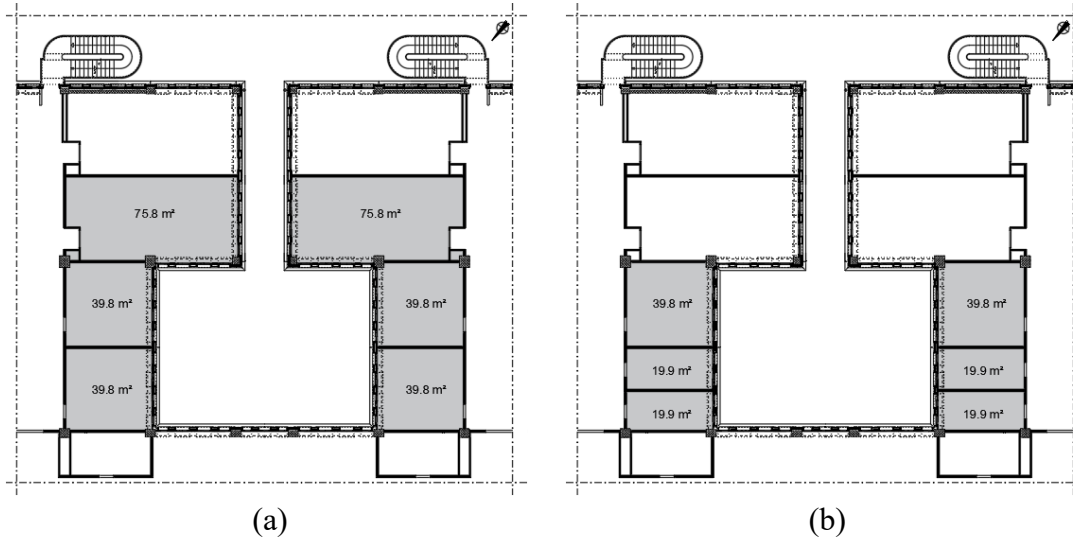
Layout of the simulated thermal zones at ground floor which correspond with first one (a) and at second floor (b).
